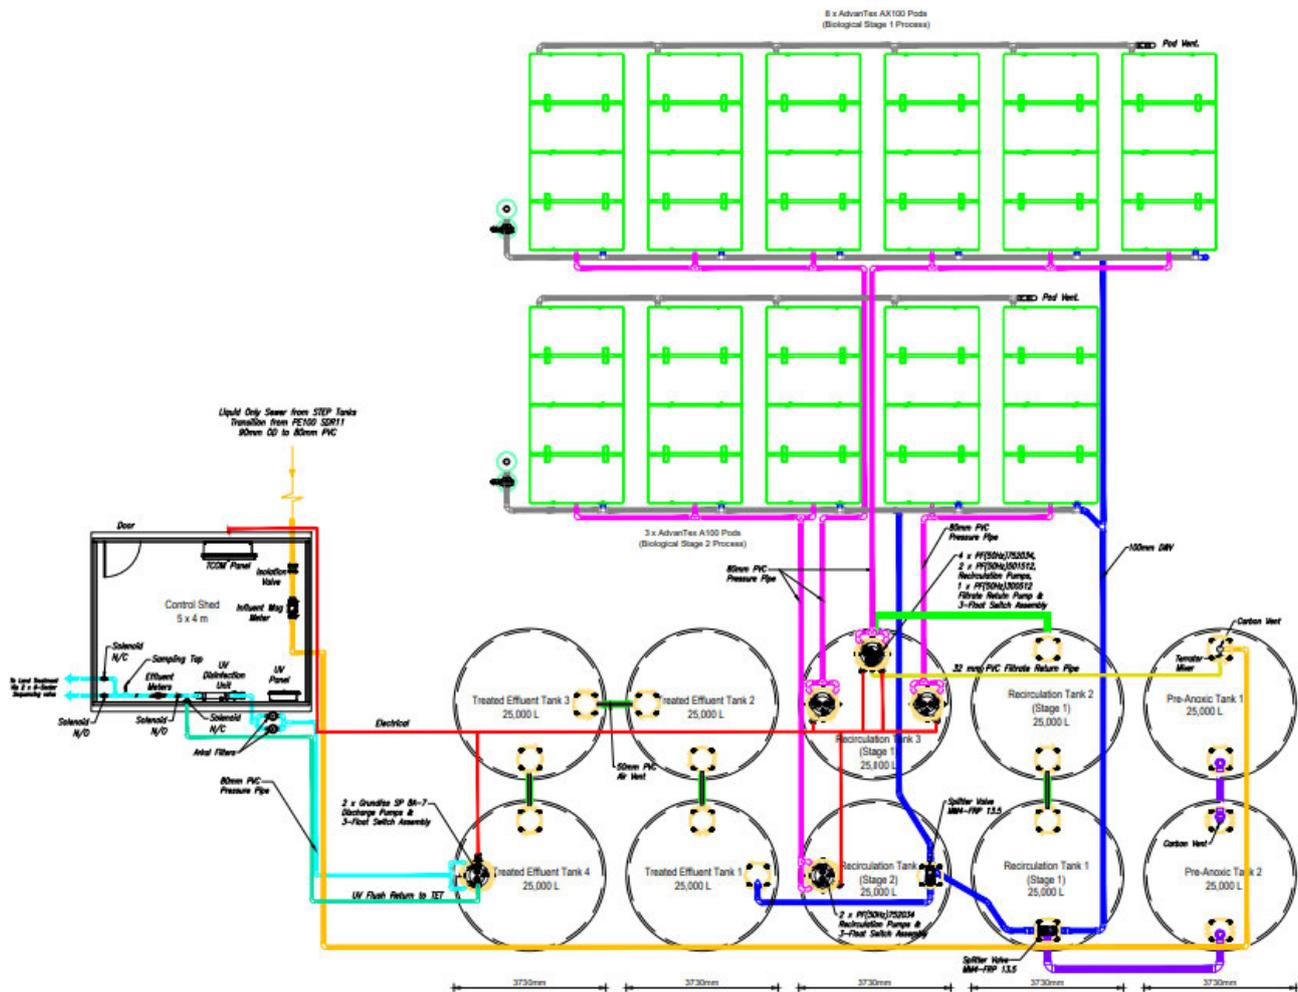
Snapshot of Proposed Wastewater Treatment Plant
